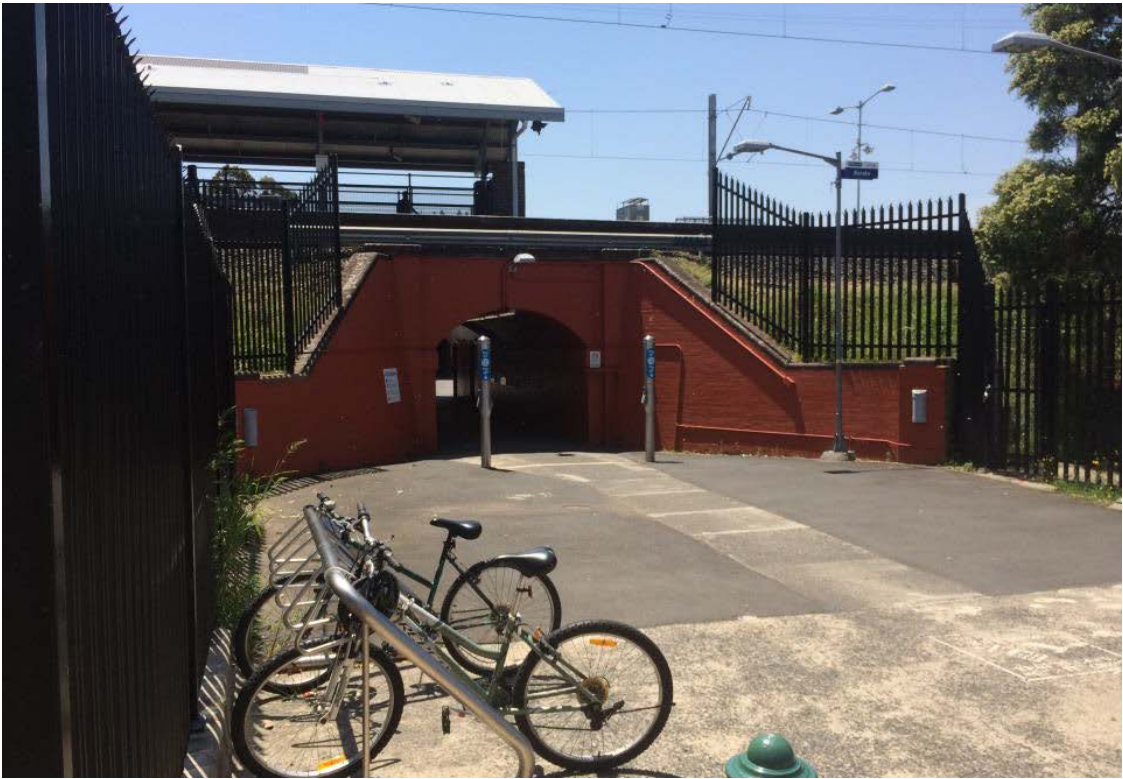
View towards Berala Station from the Campbell Street underpass entrance
